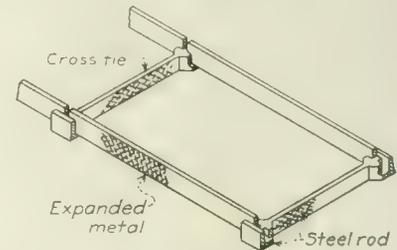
Details of a Concrete Frame for Confining and Preventing the Movement of Road Foundations.
